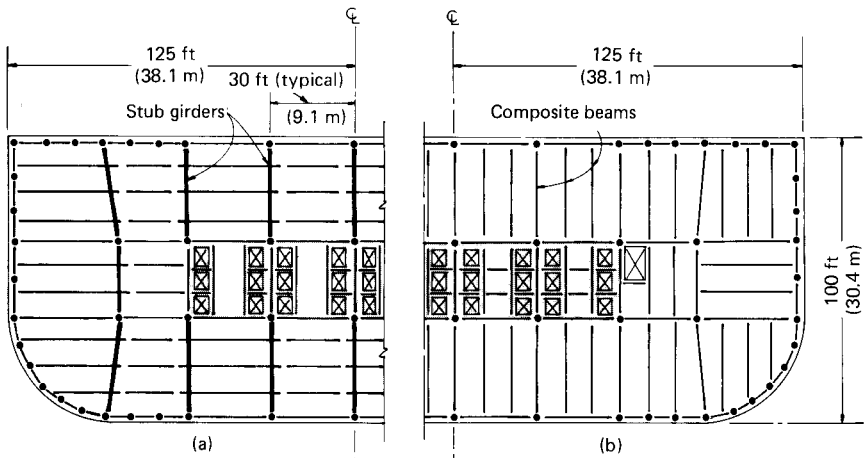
Floor framing options. (a) Stub girder scheme; (b) composite beam scheme.
